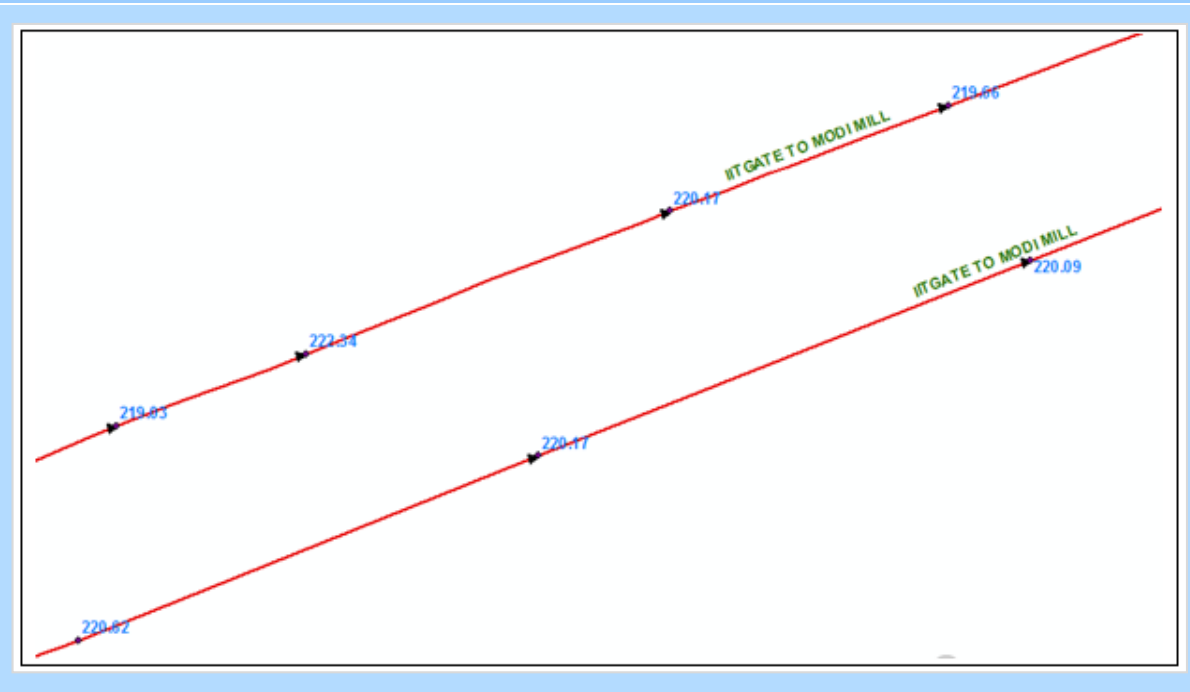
Drains with higher dimension meeting with lower dimension
